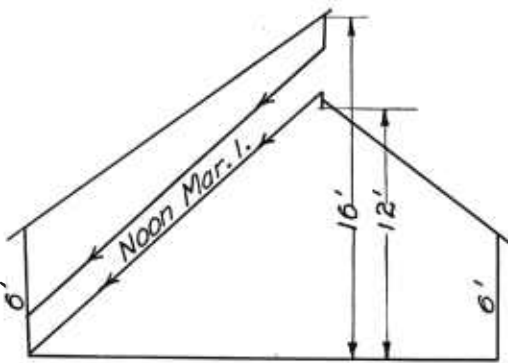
Cross section of house shown in figure 3, showing where sunshine from upper windows will fall at noon March 1.
